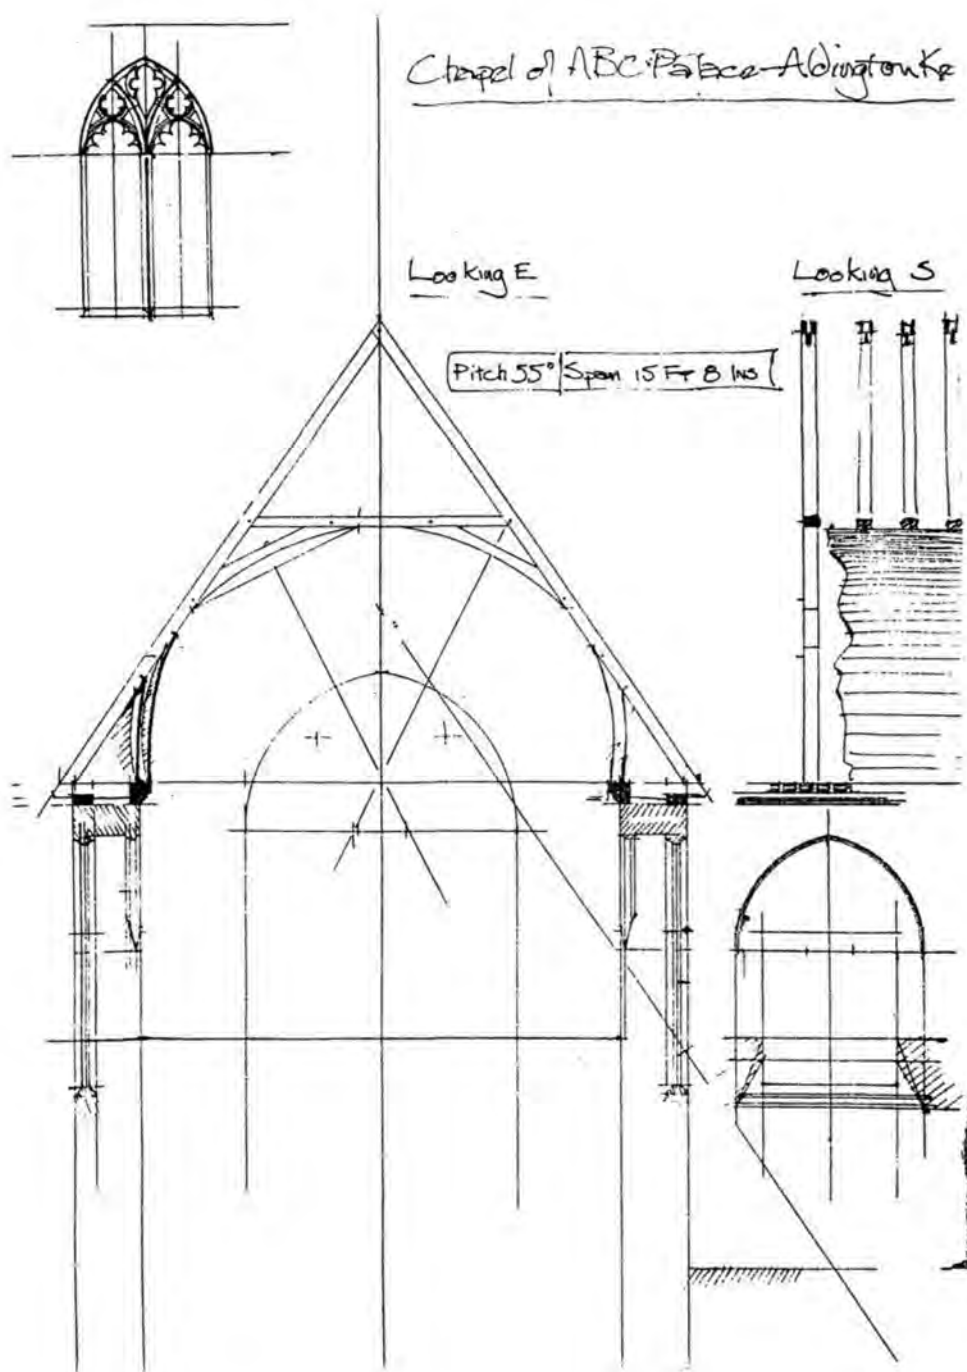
Drawings of roof cross-section and architectural details by John Bowen.
